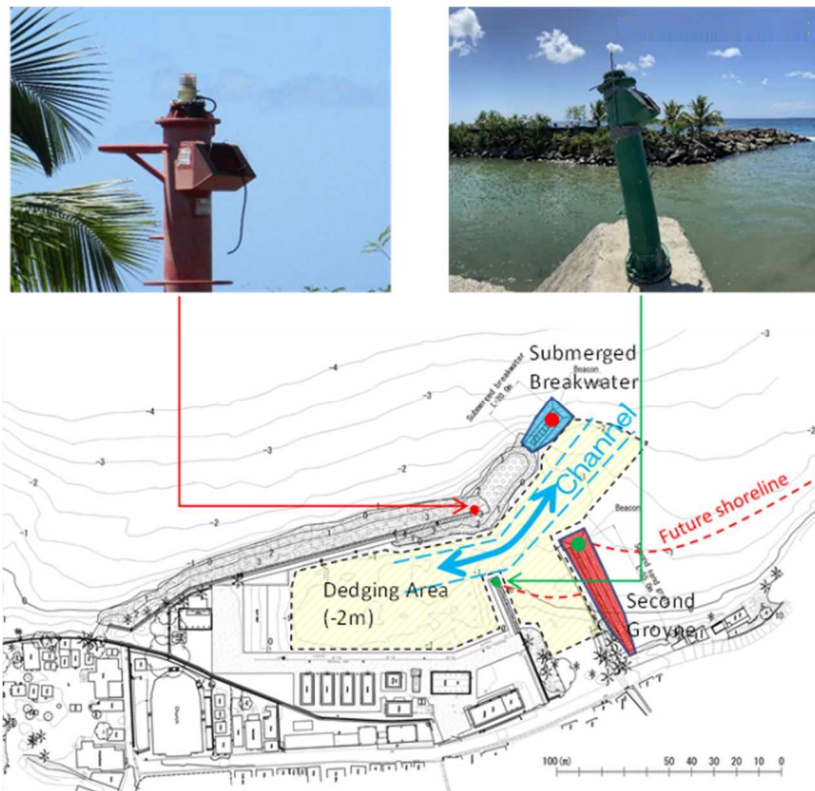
(2) Installation points of existing beacon lights to be fixed and newly installed
